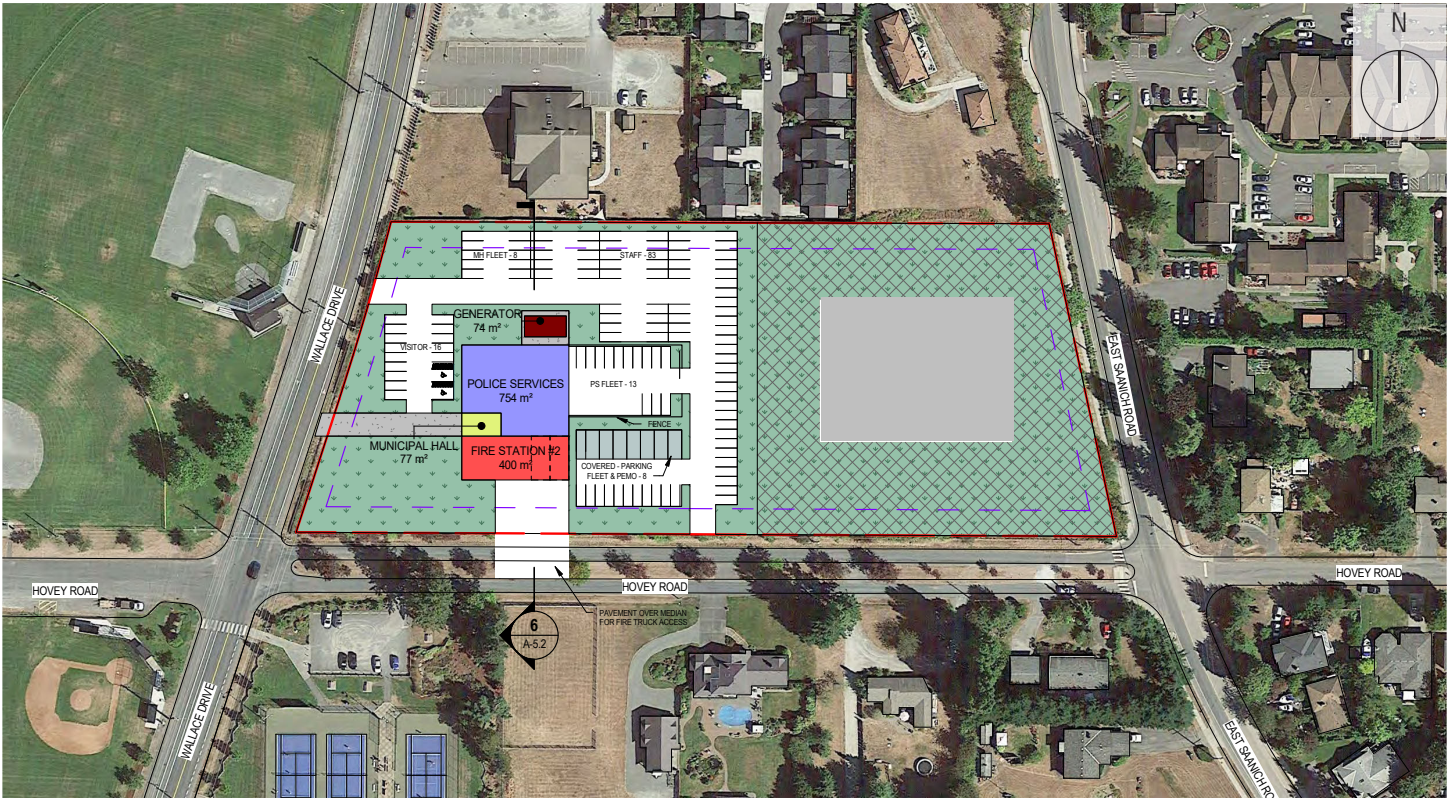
Hovey Road Site Concept: Site Distribution Concept 2
